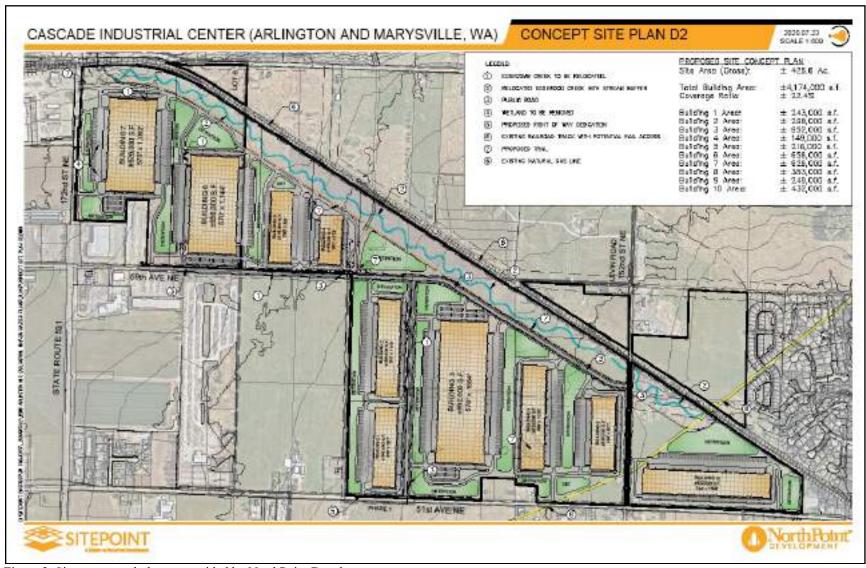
Site conceptual plan as provided by NorthPoint Development.
